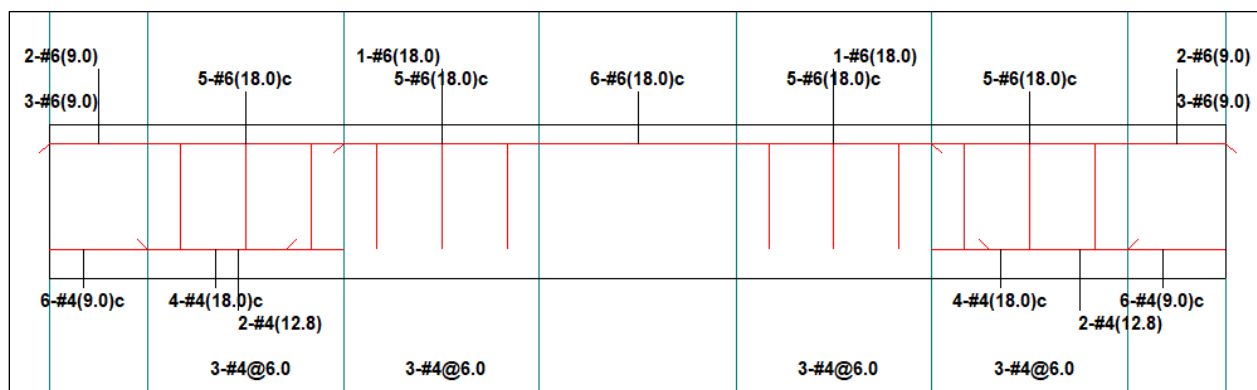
Reinforcement (Flexural and Transverse) Diagram for the Beam-on-Elastic Foundations Model
